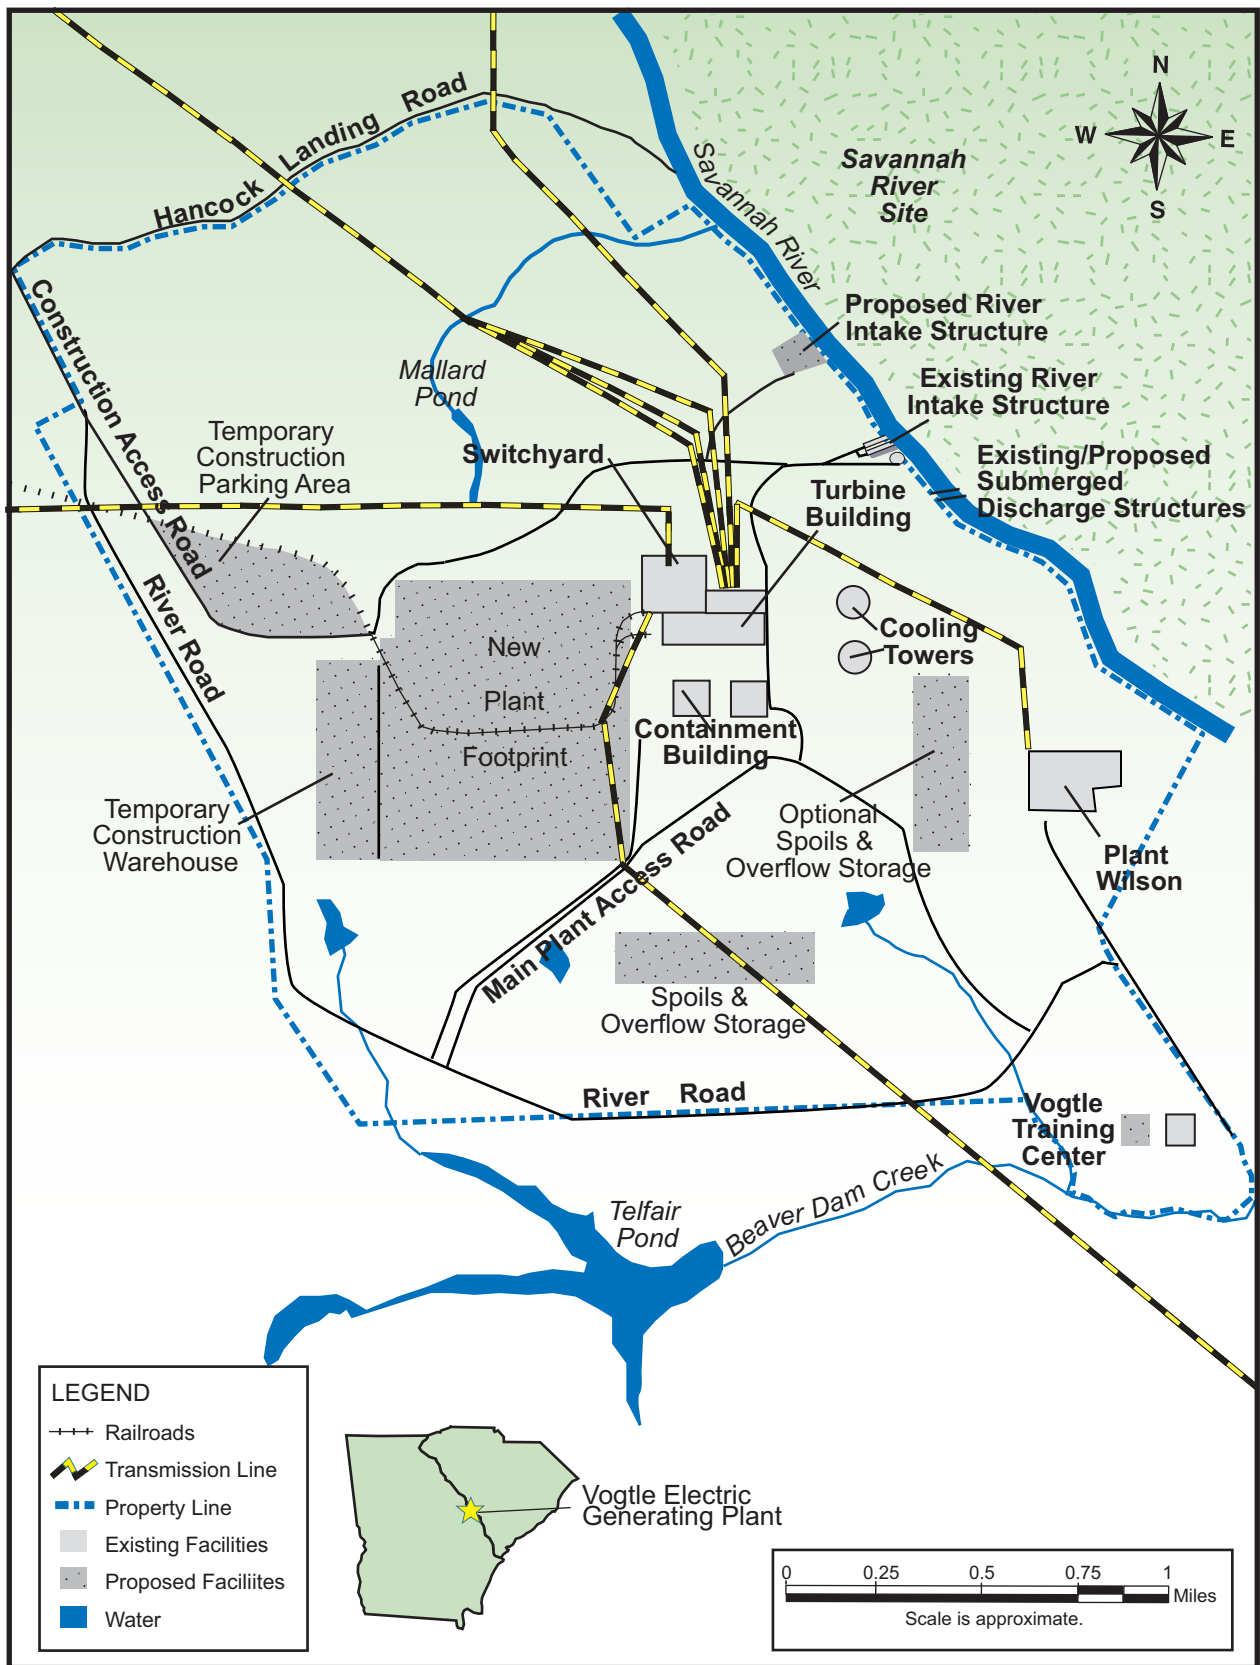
VEGP Site and Proposed New Plant Footprint
